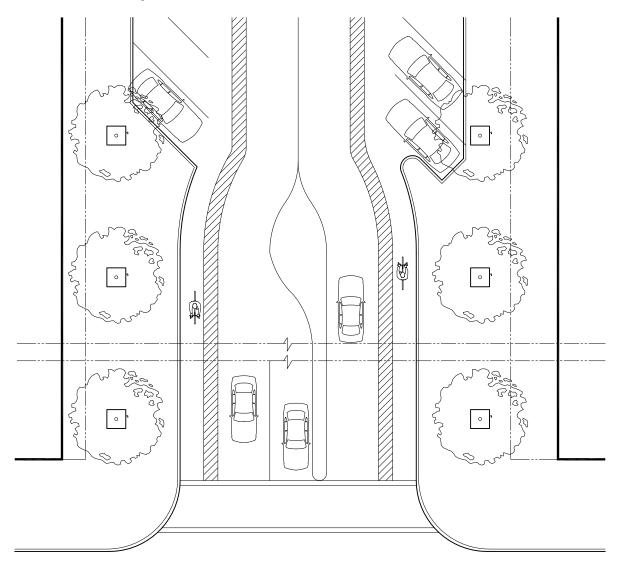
Street Type 1: Typical Intersection (Plan Perspective)
